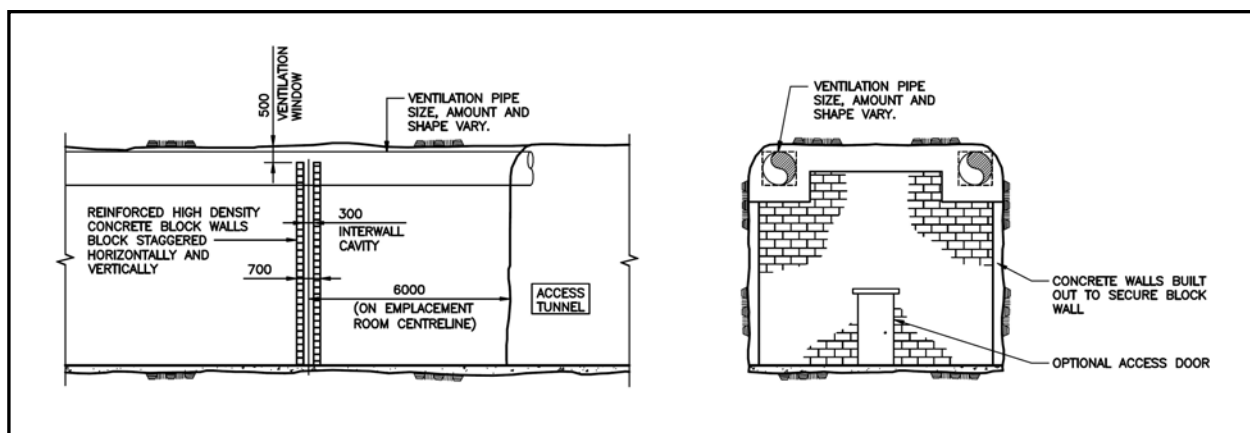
Conceptual Design for Emplacement Room Shielding Wall
